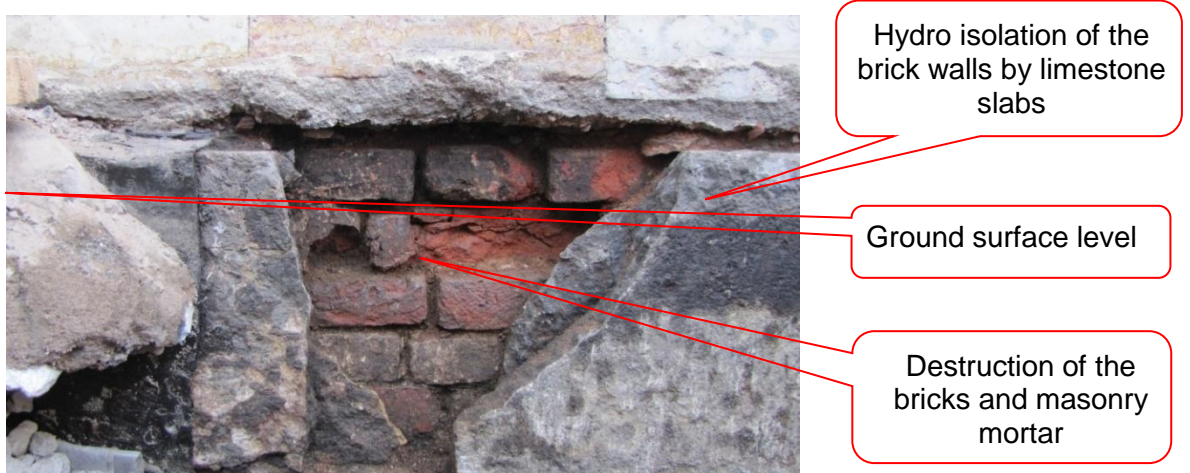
Elution and damages of limestone, brick and masonry mortar, the house №6 A
